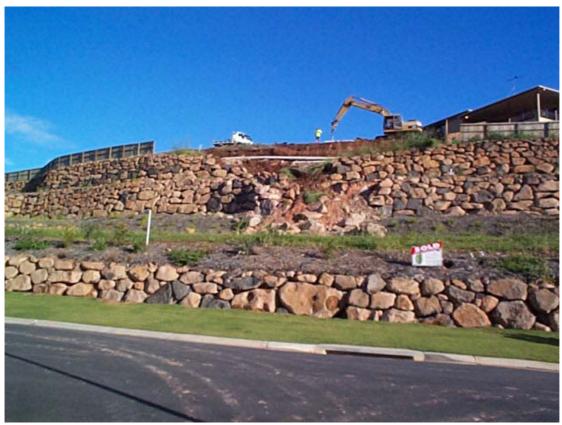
Retaining Wall Failure Bulwarra Place, Bilambil Heights
